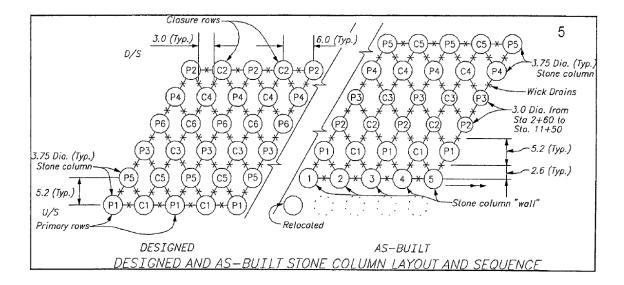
Designed and as-built stone column and wick drain treatment at the Salmon Lake Dam case history (Luehring et al, 1998).
